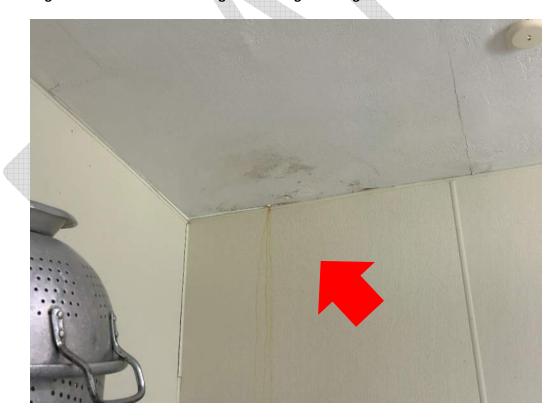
Signs of Water Intrusion through in the Ceiling.
